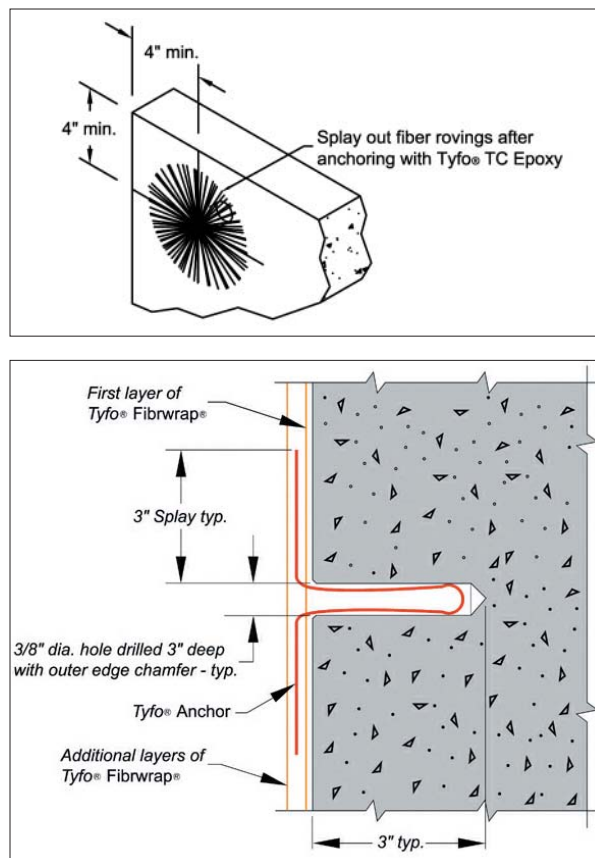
(Top) Arrangement for an embedded FRP anchor
